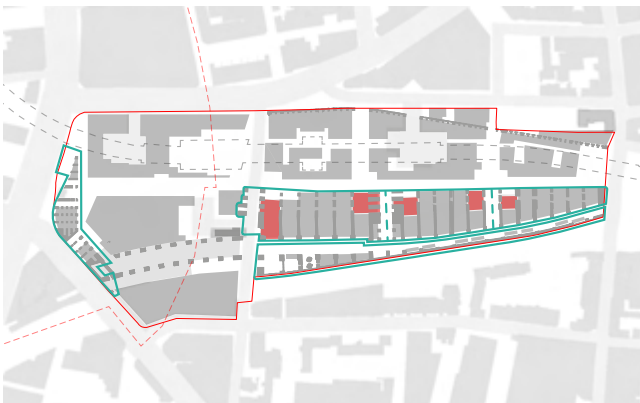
Key Plan: Locations of A3 units in Plot 7
